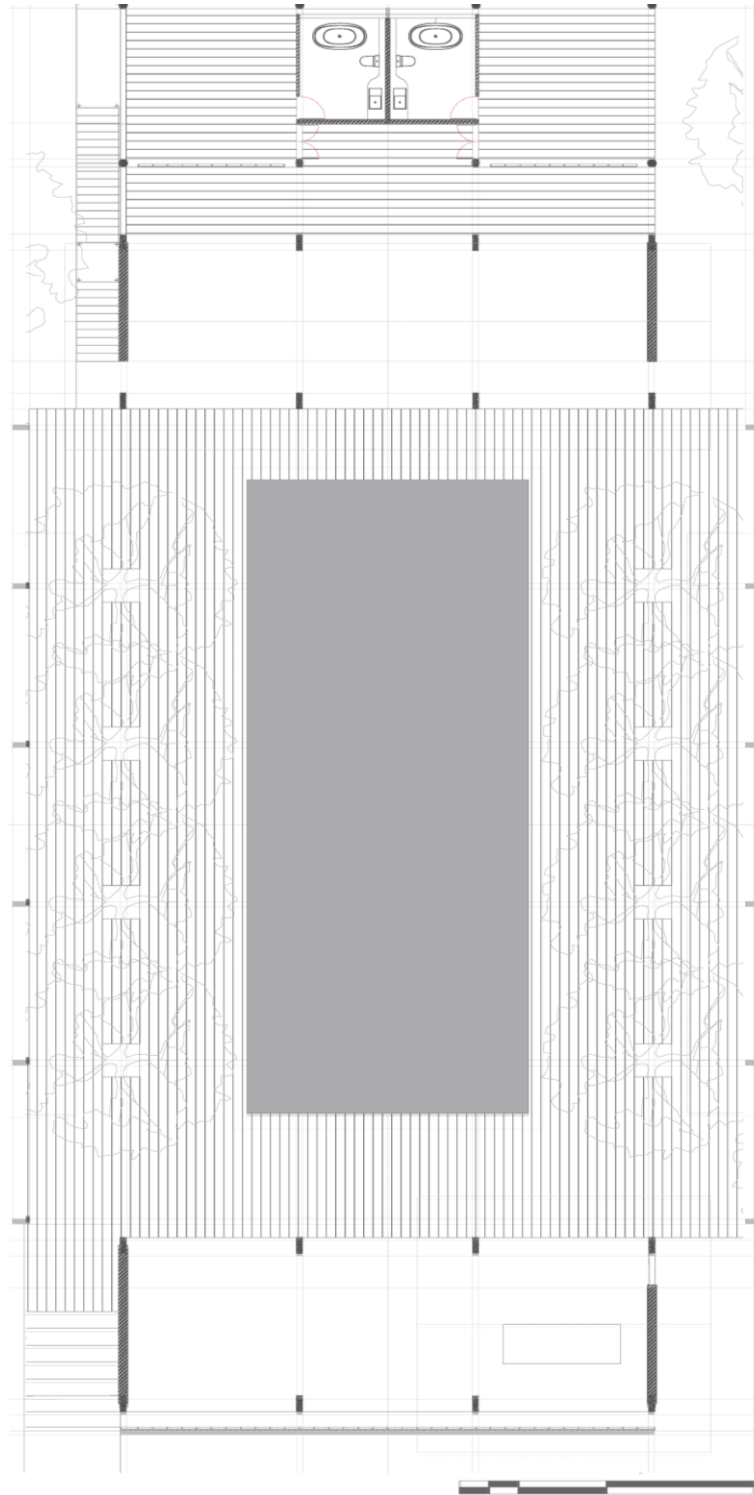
First floor plan structural enlarged main floor, drawn by author.
